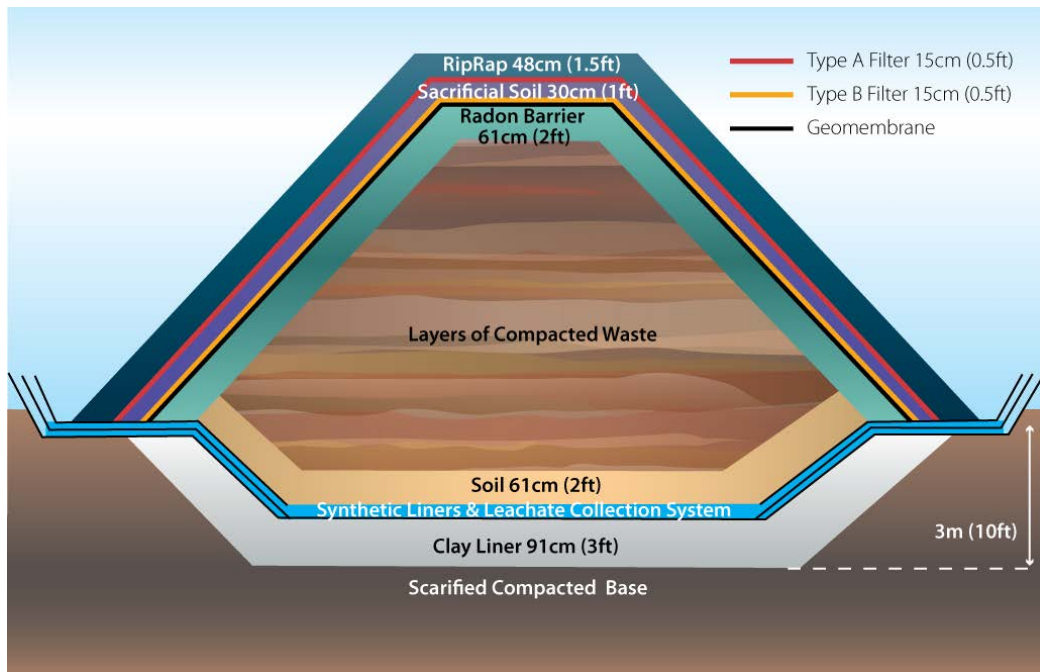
Typical example of mounded landfill waste disposal technology [2]
